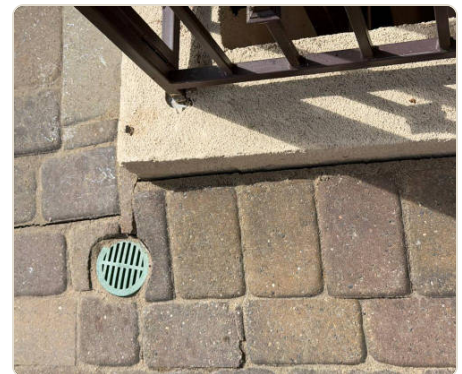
Round area drain set in pavers beside a step; pavers cracked at the grate.
